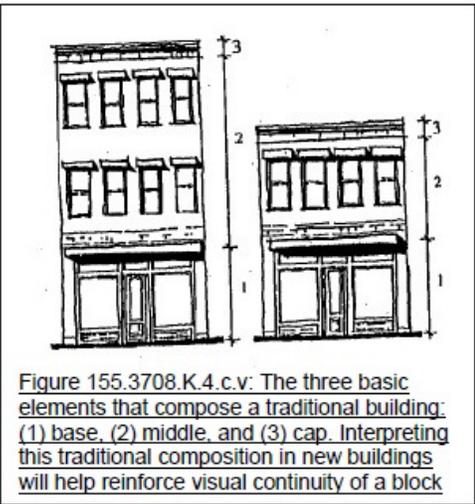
K.4.c.v: The three basic elements that compose a traditional building: (1) base, (2) middle, and (3) cap. Interpreting this traditional composition in new buildings will help reinforce visual continuity of a block
